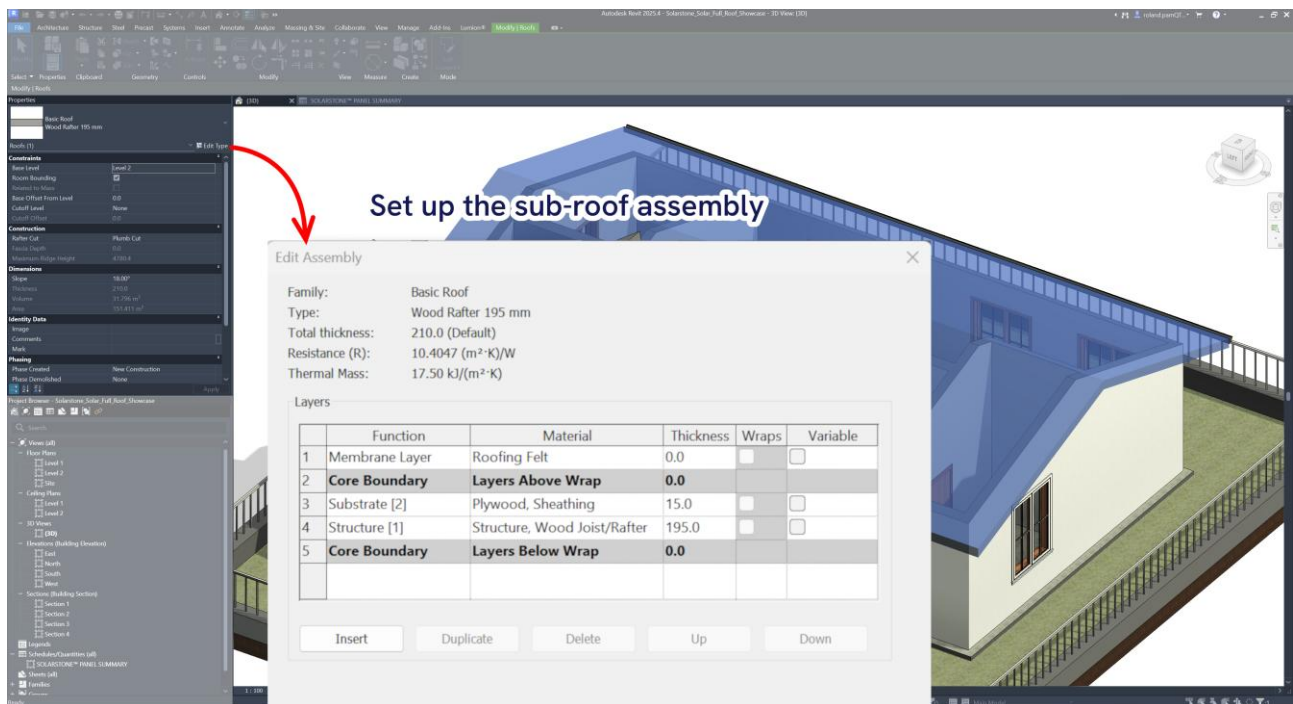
Example of a sub-roof assembly up to the underlay layer before adding the Solar Roof Base.
